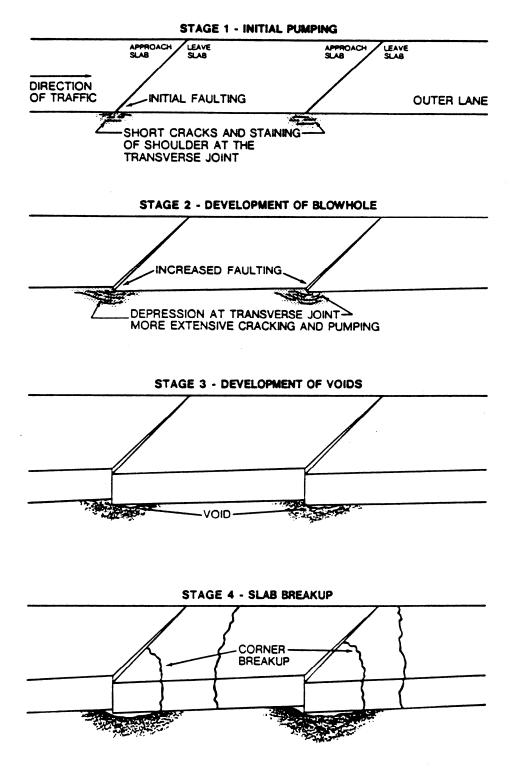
Typical stages in the deterioration of a concrete pavement (Darter, Barenberg, and Yrjanson 1985).
